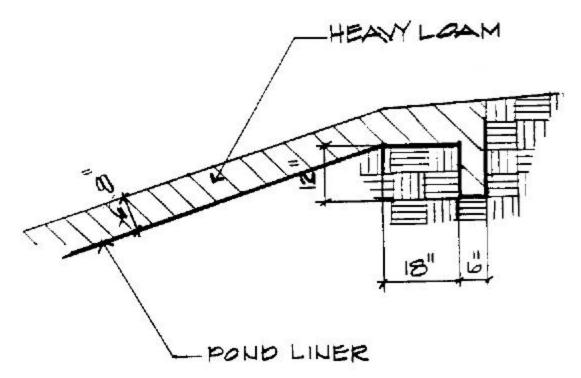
Example of Liner Installation on Earthen Slope (Courtesy COA)
